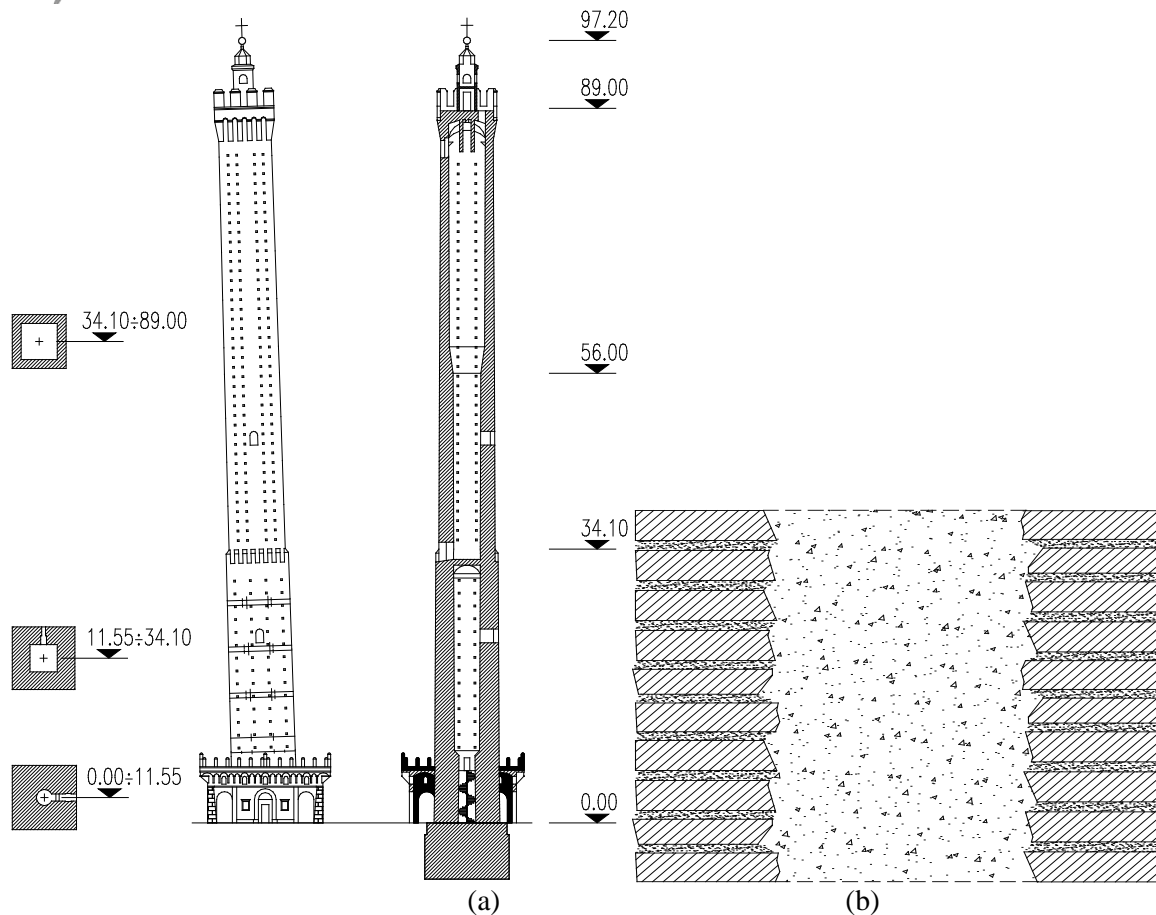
The tower elevation with the indication of the main discontinuities. (b) A schematic view (vertical cross-section) of the “a sacco” masonry.
